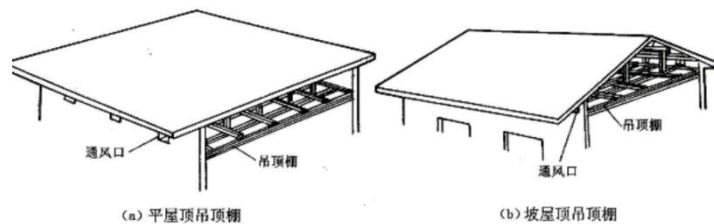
Ventilation is set on the cooling and insulation roof below the roof structure
